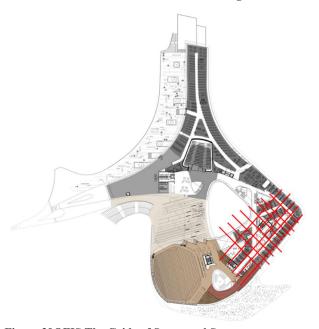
QFIS Structural system Roof Steelwork- source: www.constructionweekonline.com
